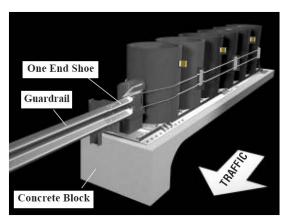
Permanent Construction which requires Below-Grade Anchor Block
